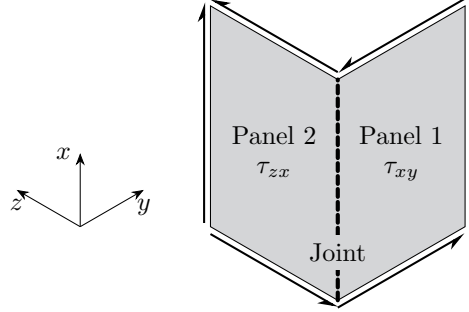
Corner joint connecting two reinforced concrete panels subject to pure shear analysed using a single joint element.
